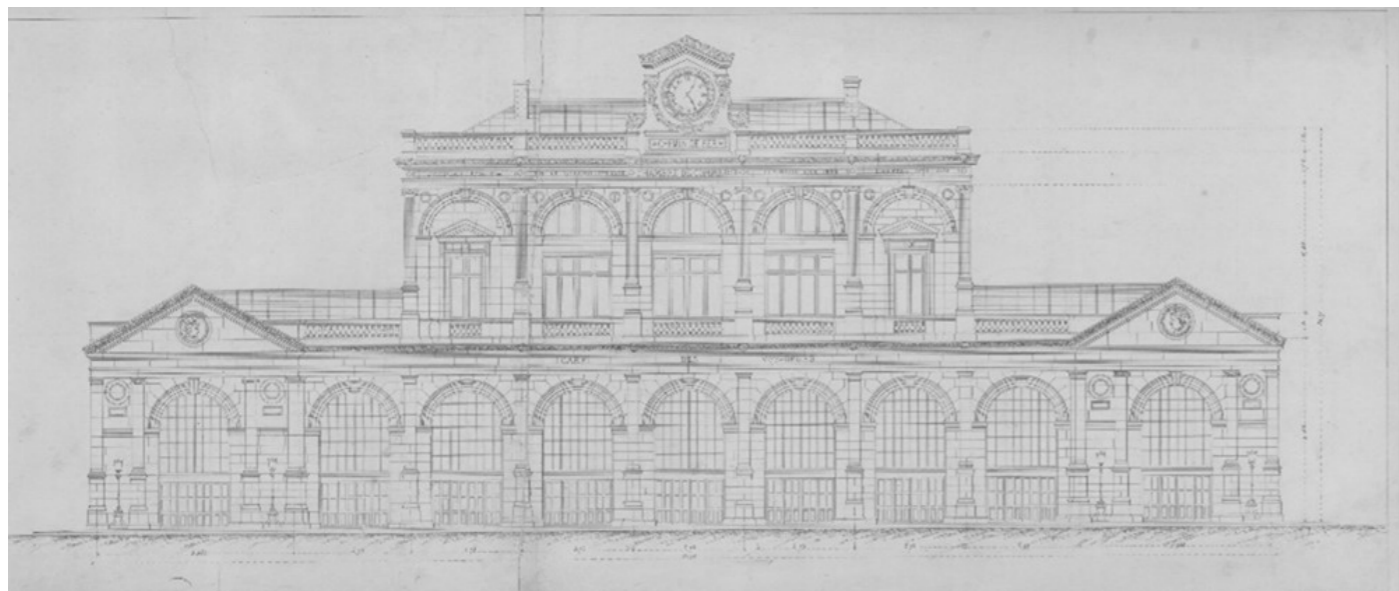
drawing of Gare de Lille reconstruction that re-used the previous Paris Gare du Nord station's façade, redesigned by architects Léonce Reynaud and Sidney Dunnnett (SNCF archive 1865)
